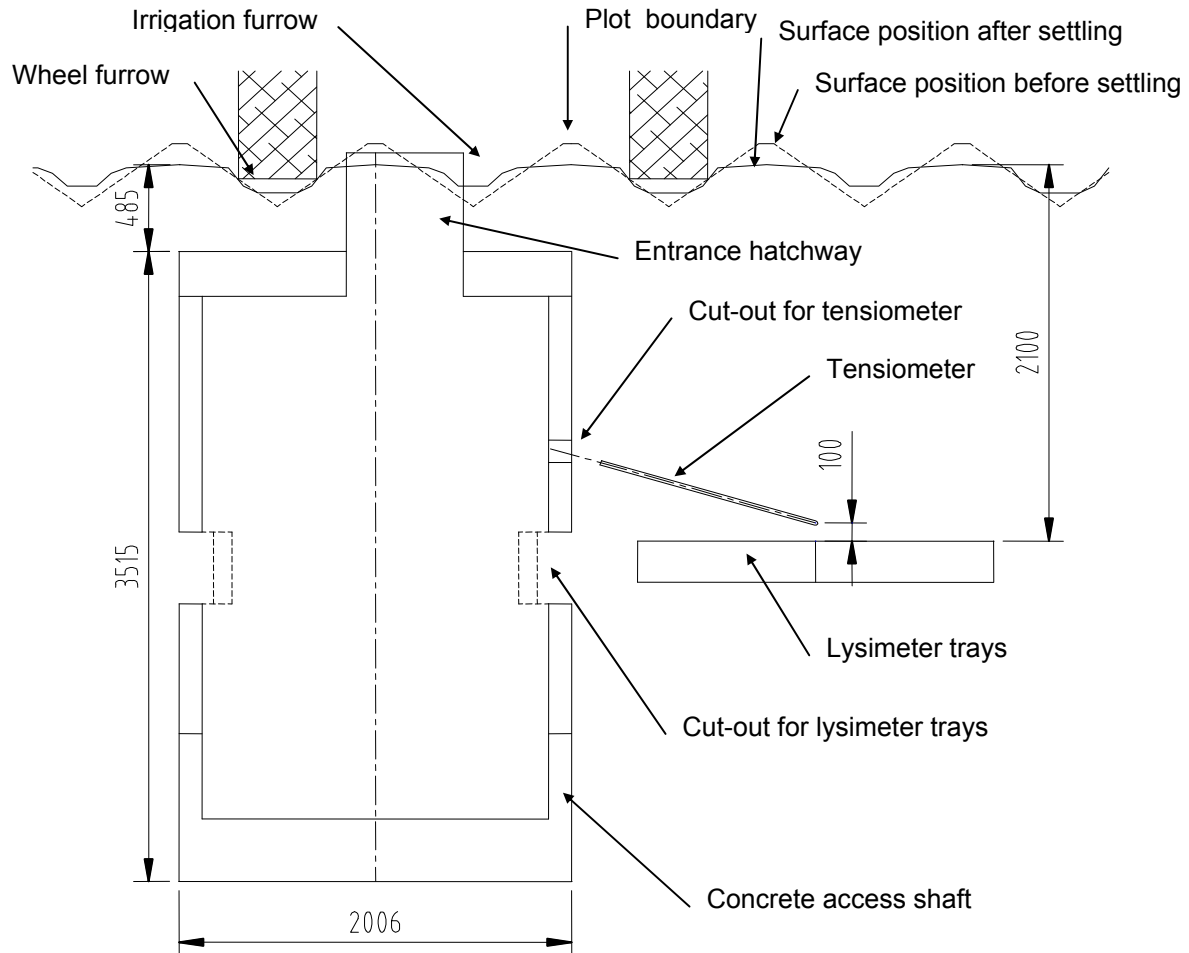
Vertical cross-section through the centre of the access shaft at 90° to the furrows. Dimensions in millimetres.
